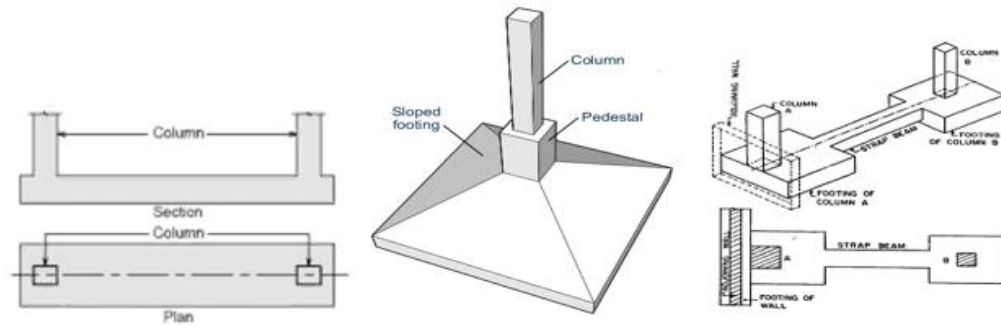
Rectangular foundation, trapezoidal foundation and strap foundation
